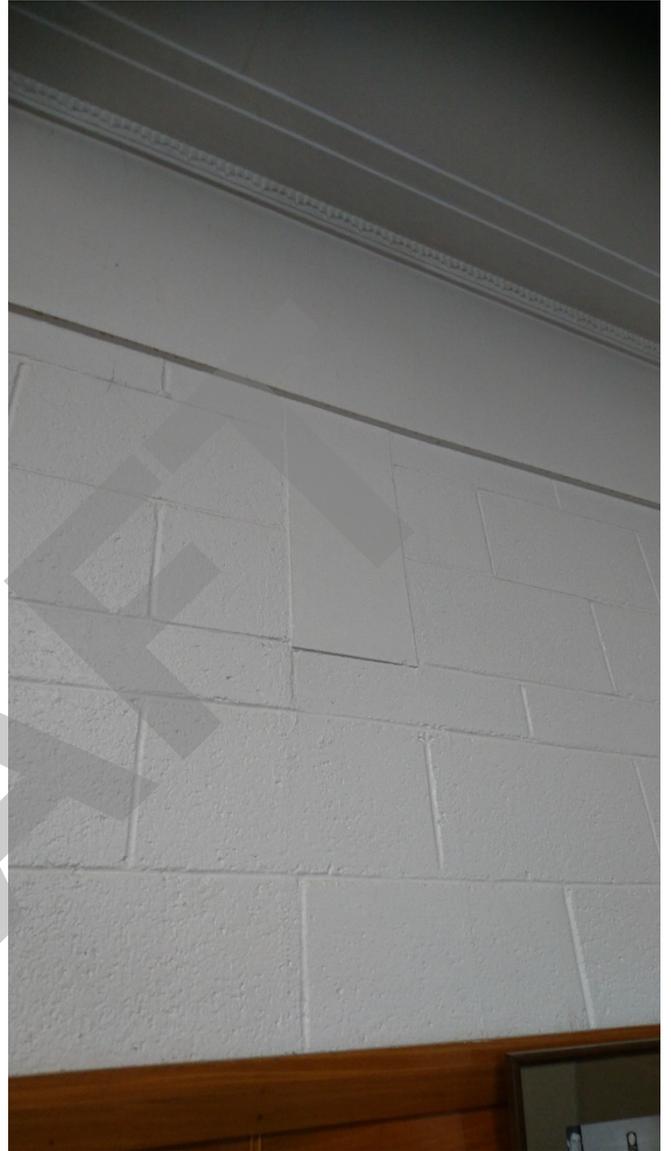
View of concrete block wall with reinforced concrete bond beam; note that the 'deep rectangle' in the wall is the end of a reinforced concrete beam that spans 'into the photo'
